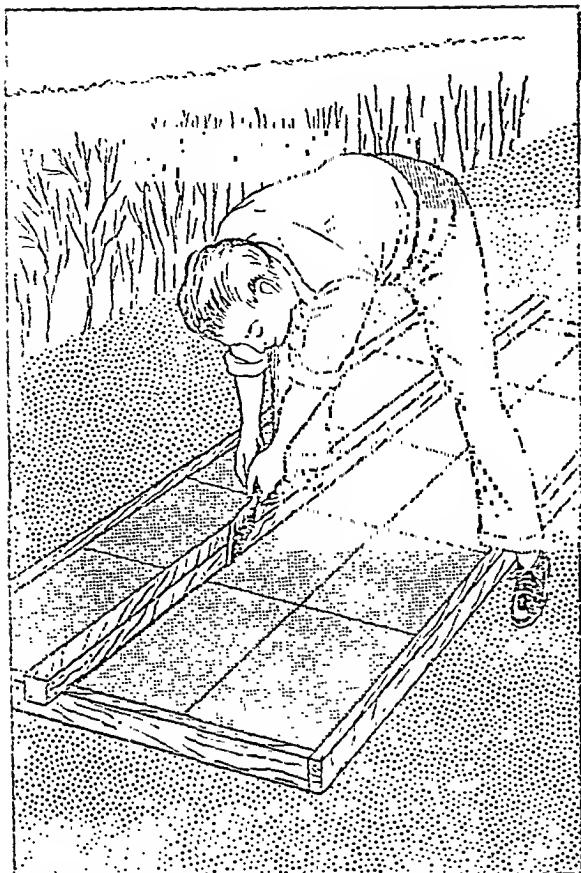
Making concrete slabs inside a form-work as described on pages 141-142
